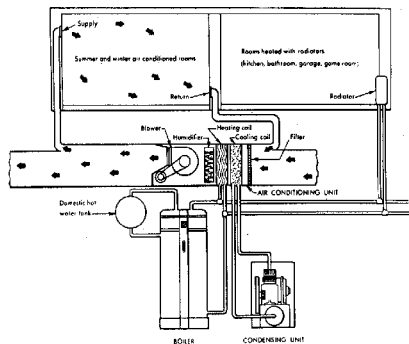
CENTRAL PLANT AIR CONDITIONER SPLIT SYSTEM
